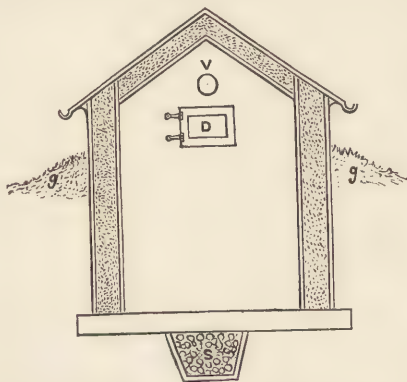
Vertical Section—V, Eight-inch Ventilator; D, Filling Door; g g, Ground Surface on upper side; S, Stone under centre for drainage.
